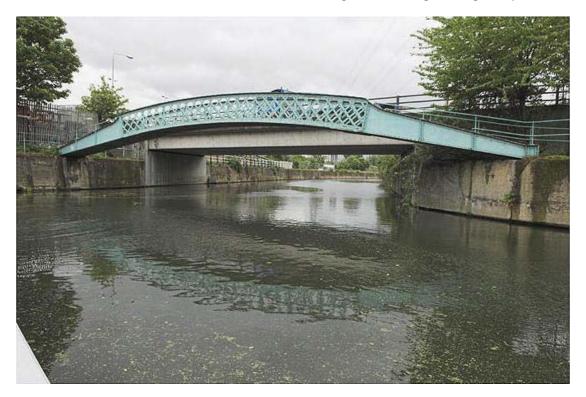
View of City Mill River footbridge with Marshgate Lane road bridge in background, looking north-east: OL-03507
